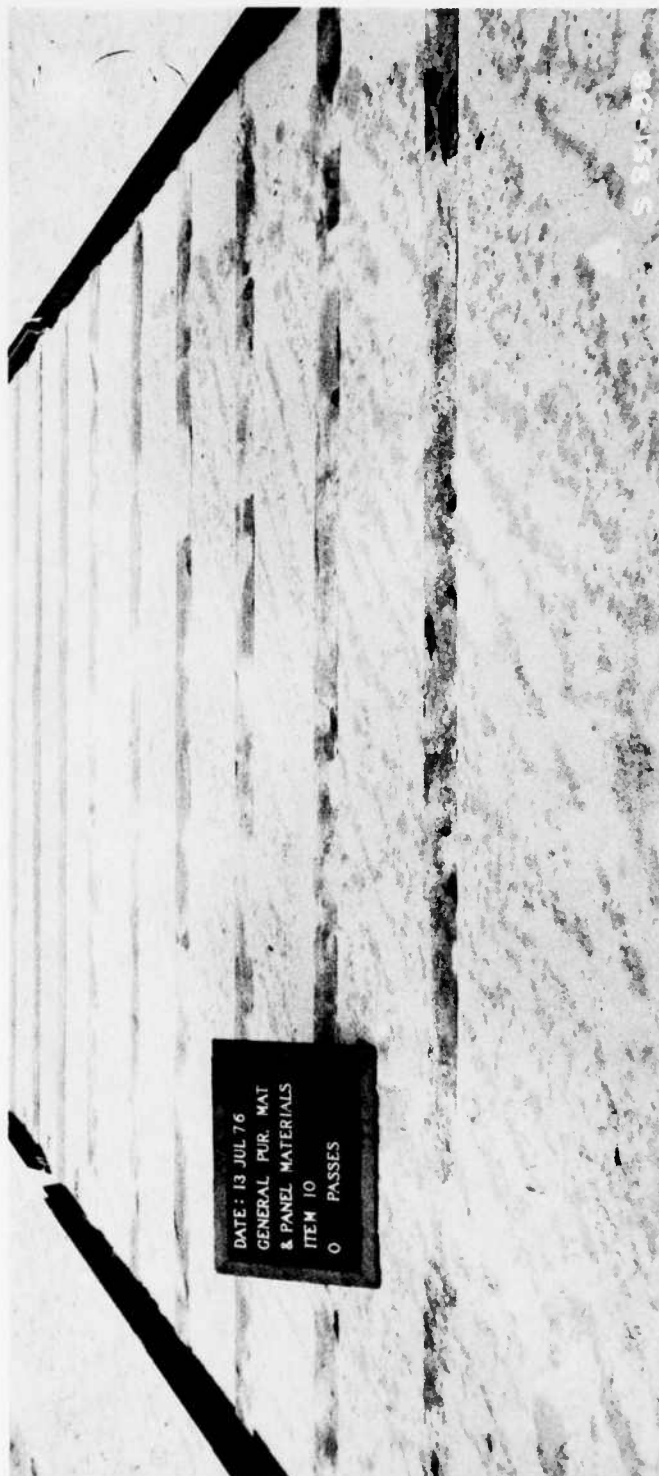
Item 10, test section 3; Spur-Ecolite one-skin panels with skin down and core filled with sand prior to traffic
